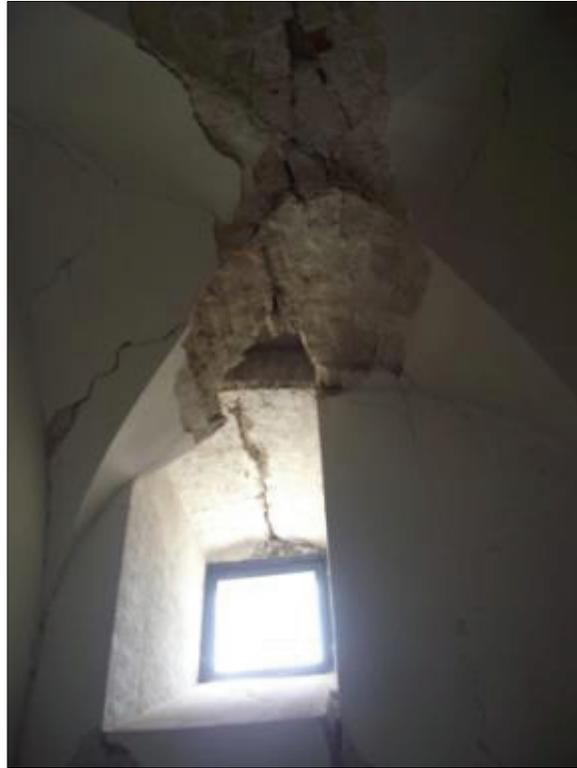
Vertical cracks at the base of the tower in the East side of Piazza Palazzo
